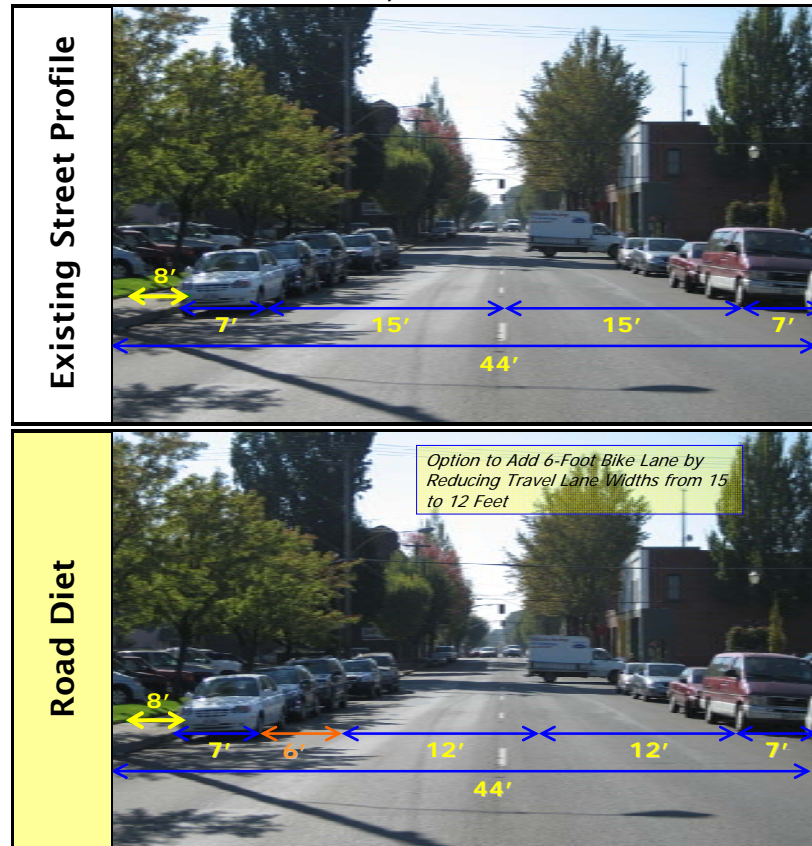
illustrates another Road Diet application, in this example on Highway 99W (Baker Street) within the one-way couplet section. By reducing travel lanes from 15 to 12 feet, a new 6-foot bike lane can be added.
